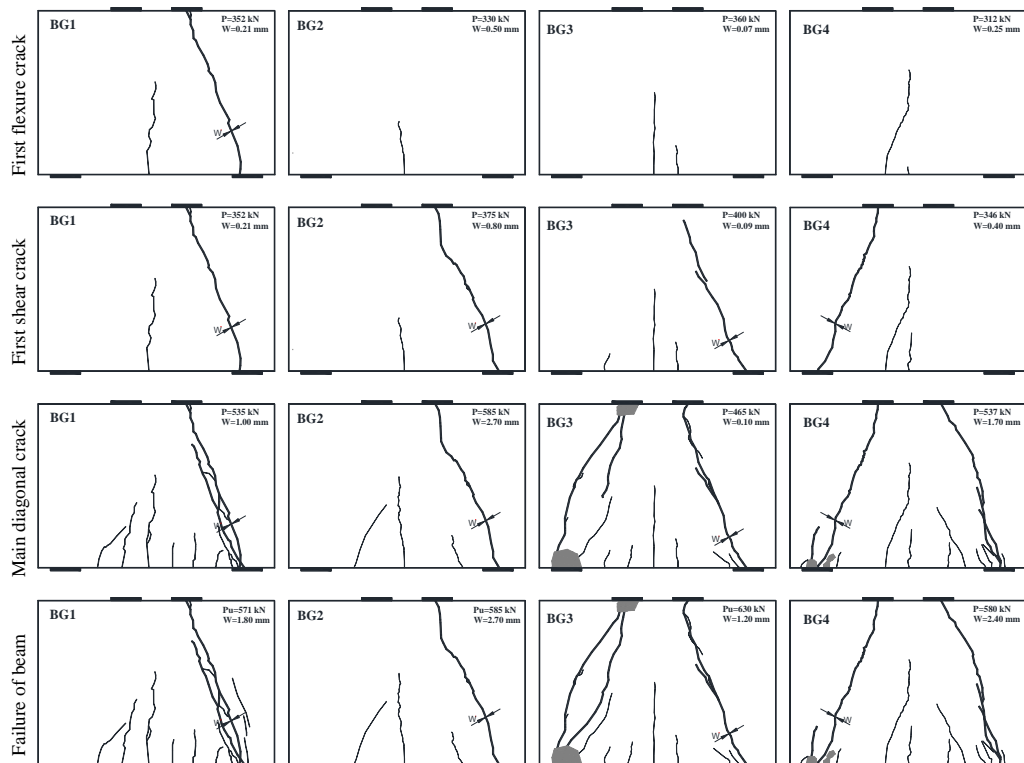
Crack development and mode of failure for the deep beam with GFRP web reinforcement
